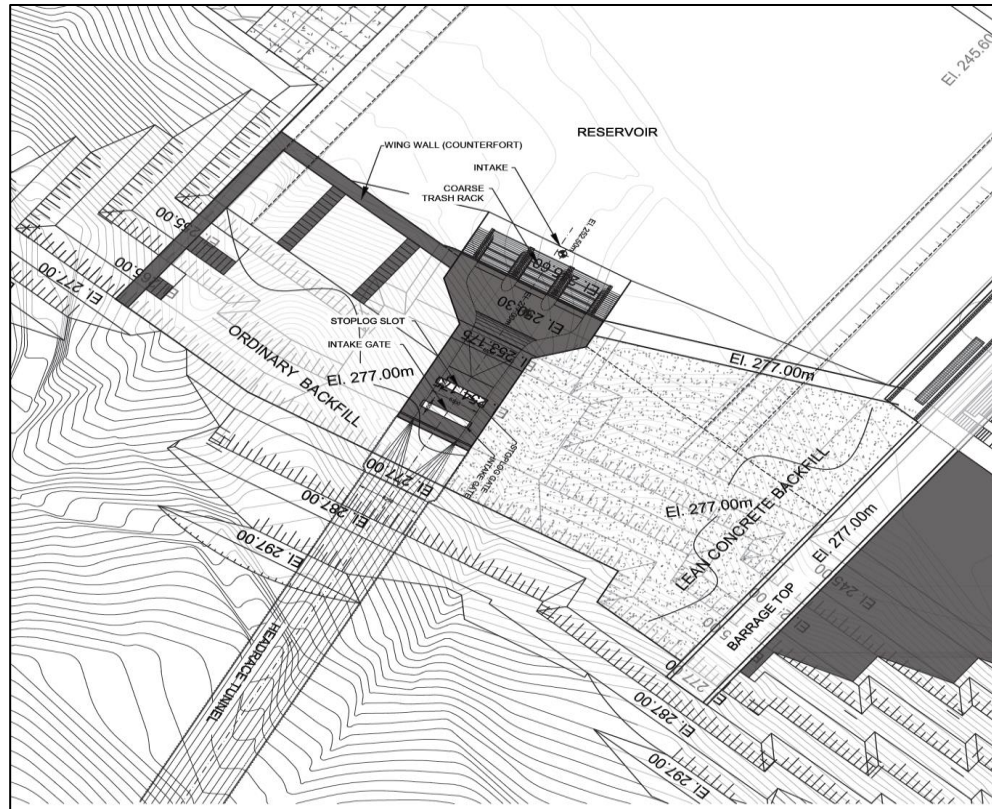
Layout of the Power intake (Source: Detail Design Report, 2021)
